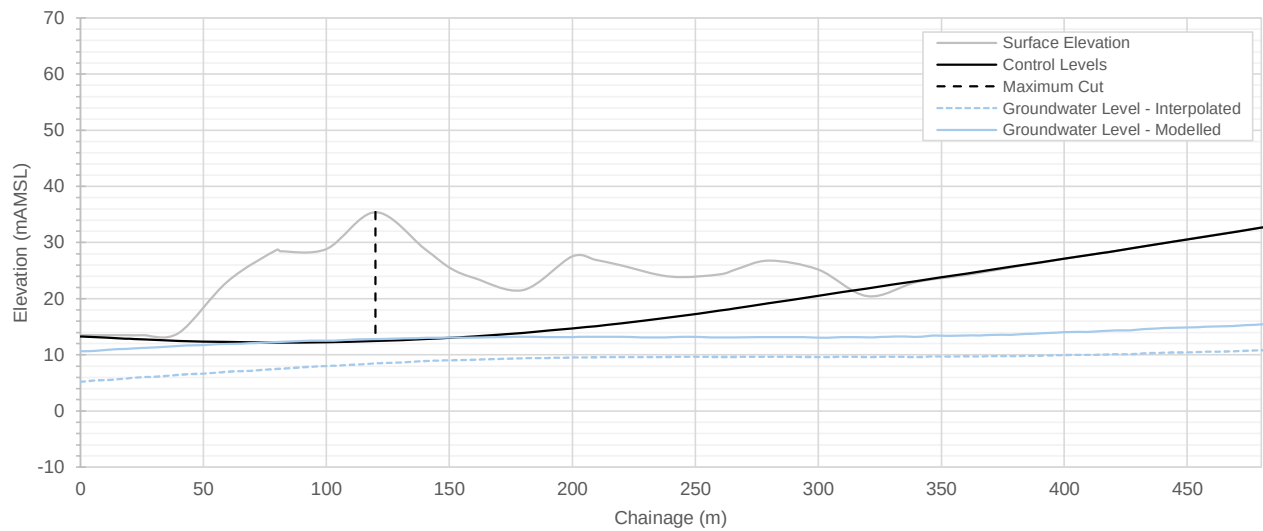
Long section along 0 to 480 m (Redwood Lane Interchange Existing SH29 Extension RS250)
